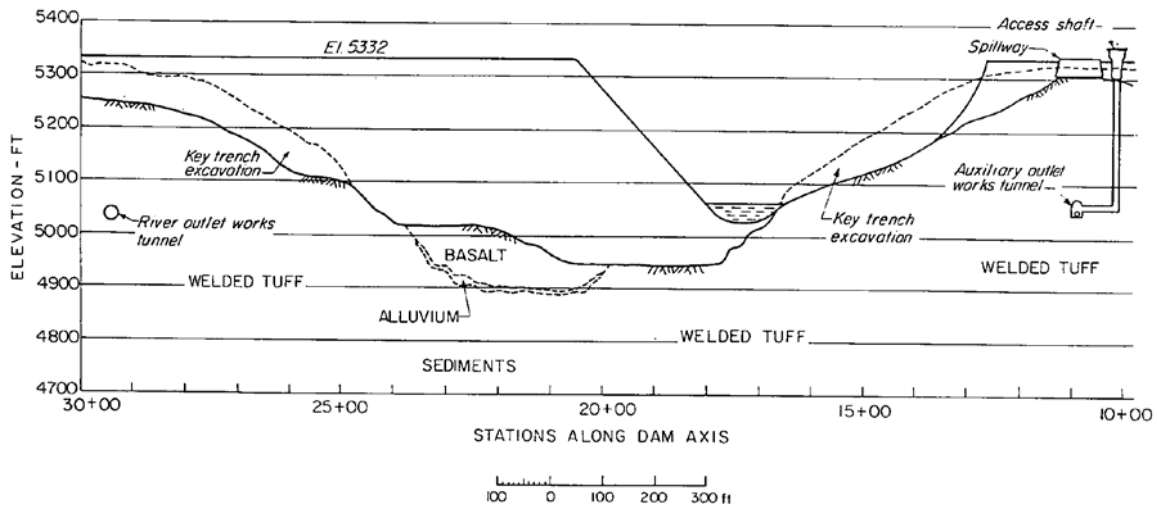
Profile of Teton Dam following failure from internal erosion at the right abutment (Independent Panel to Review Cause of Teton Dam Failure 1976).
